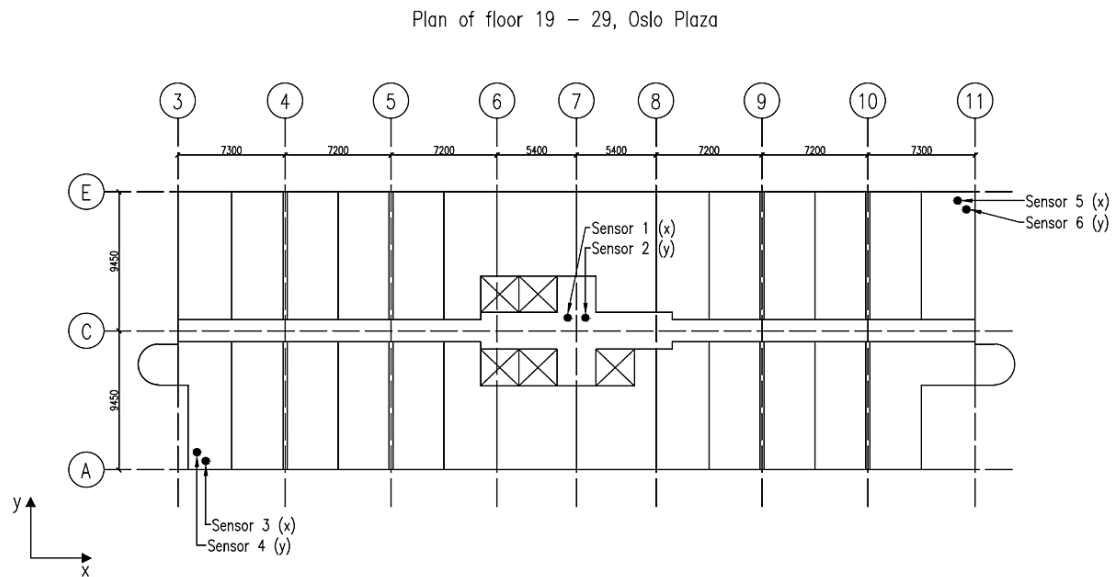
Plan of floor 19-29 with placing of the sensors.
